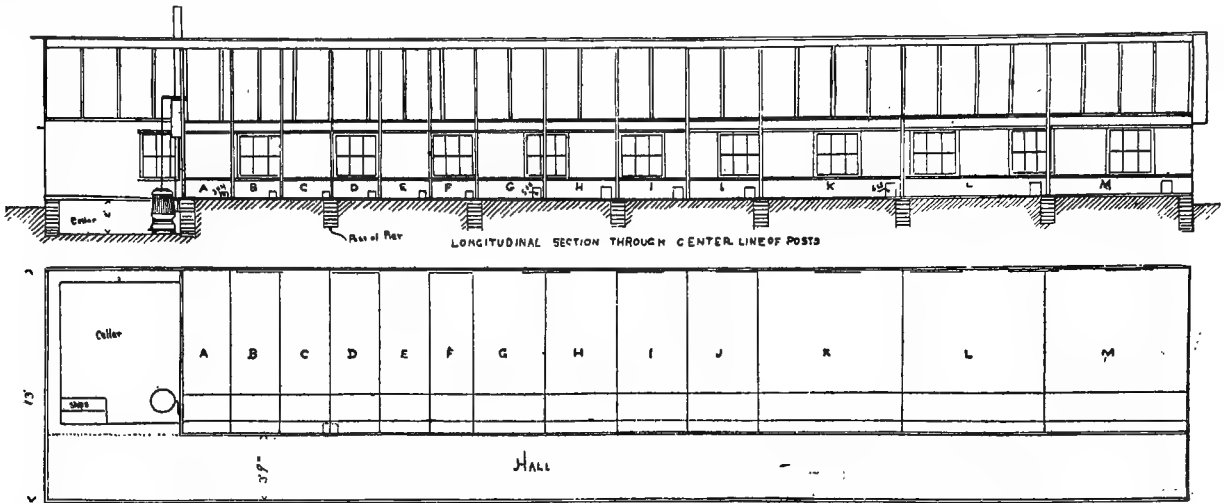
GROUND PLAN AND SECTIONAL VIEW OF HAMMONTON BROODING HOUSE
